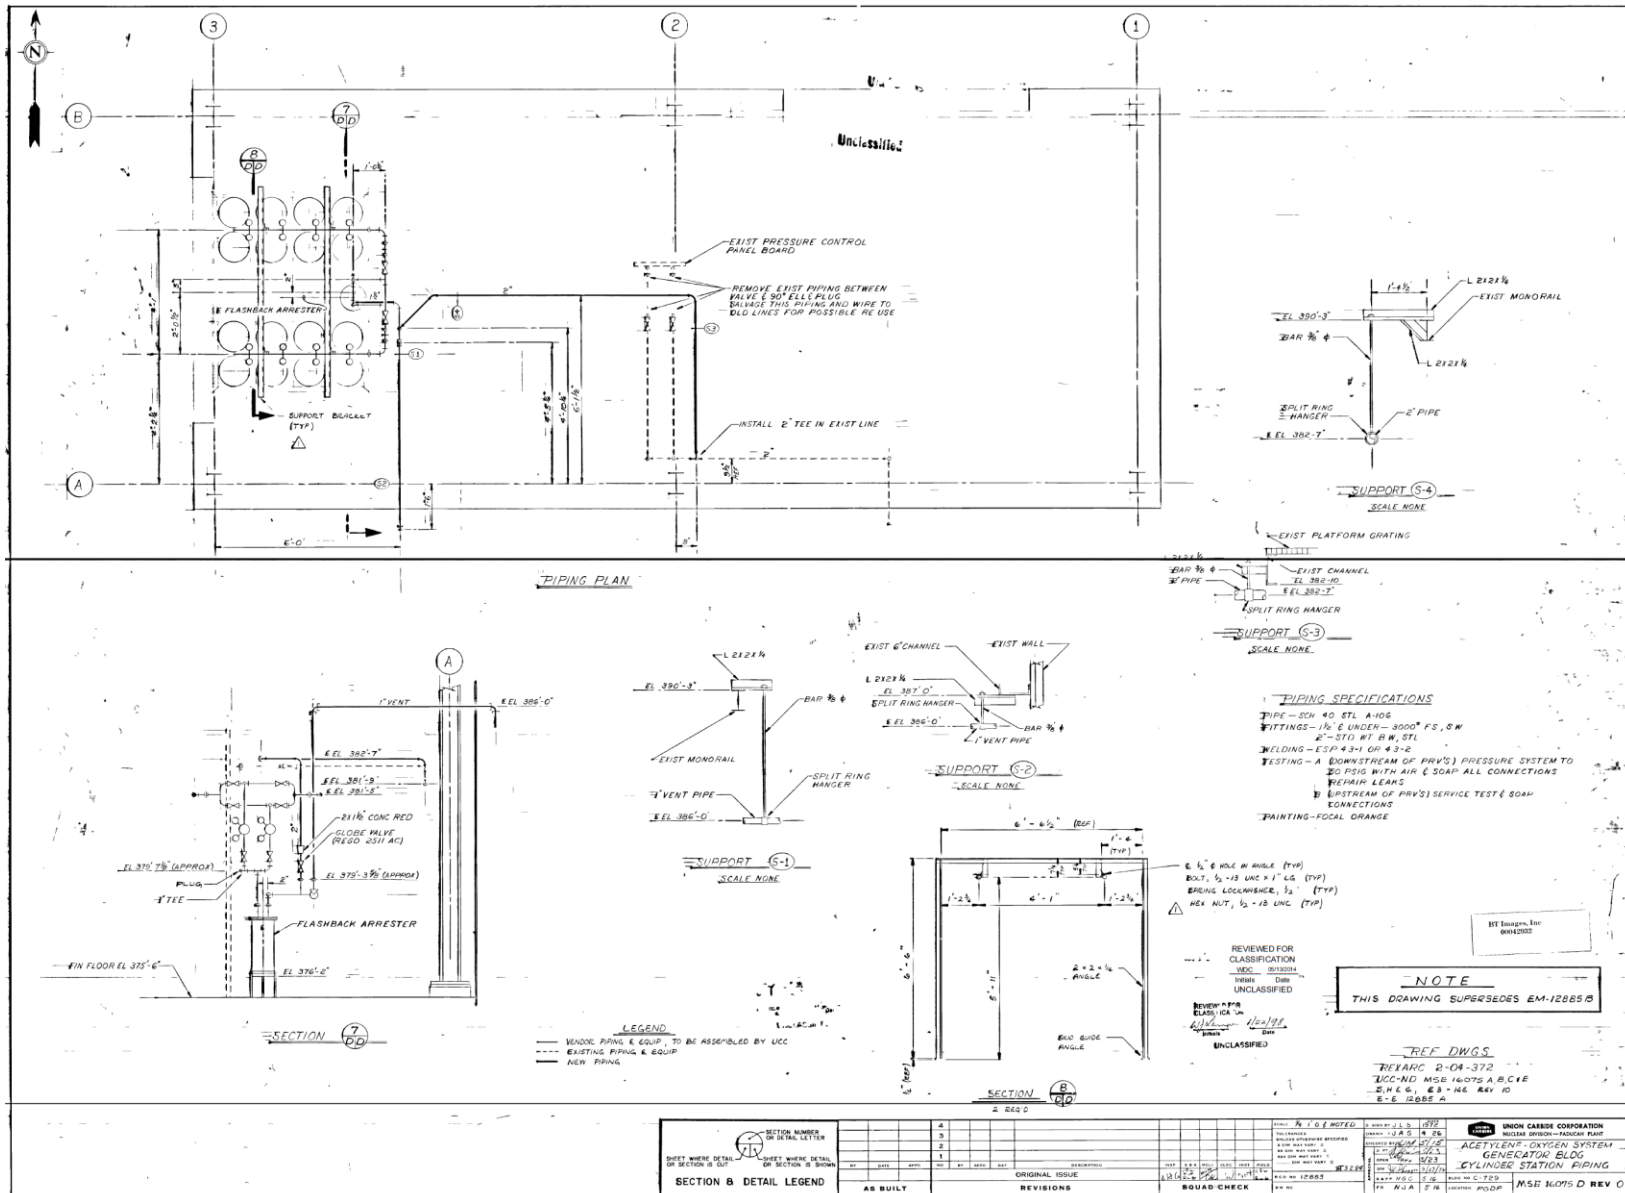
Engineering Drawing M5E-16075-D, Rev. 0
